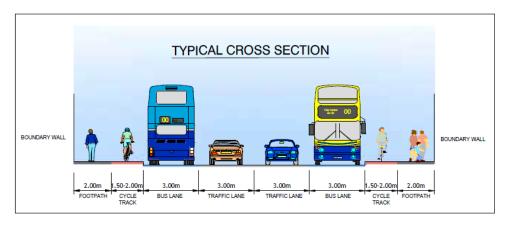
Typical Cross Section with Cycle Route Option 2 at Clanbrassil Street
